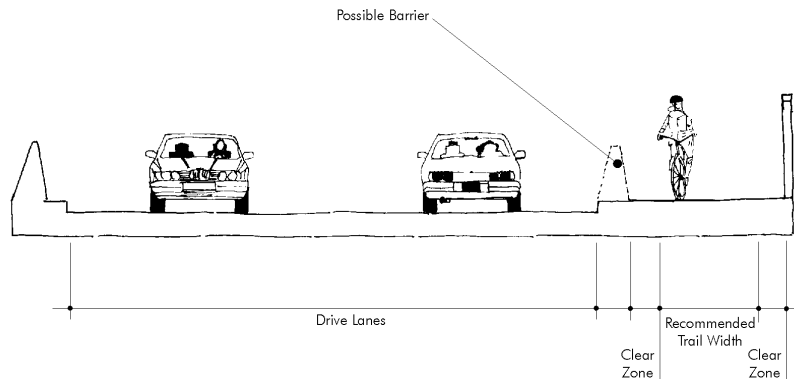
TRAIL ON NEW ROADWAY BRIDGE
